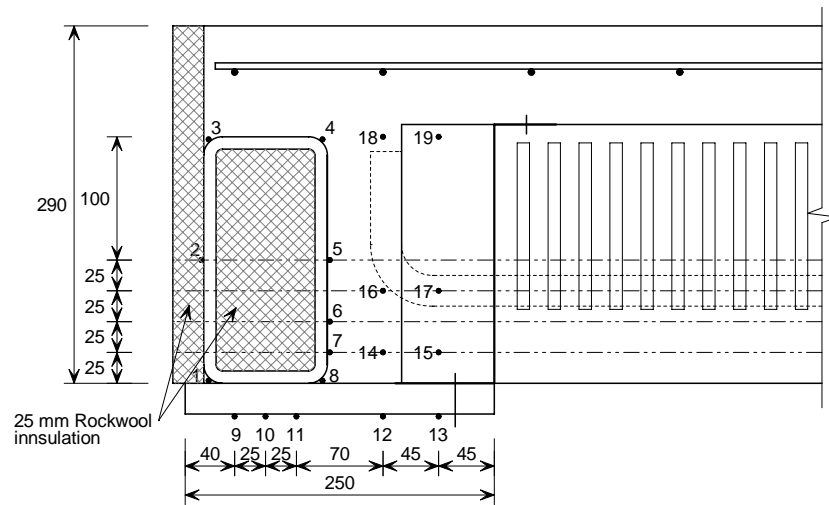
Thermocouple location at cross section C, D, E, F, G and H (N.B: Sections G & H only TC's 1 to 13 installed).
